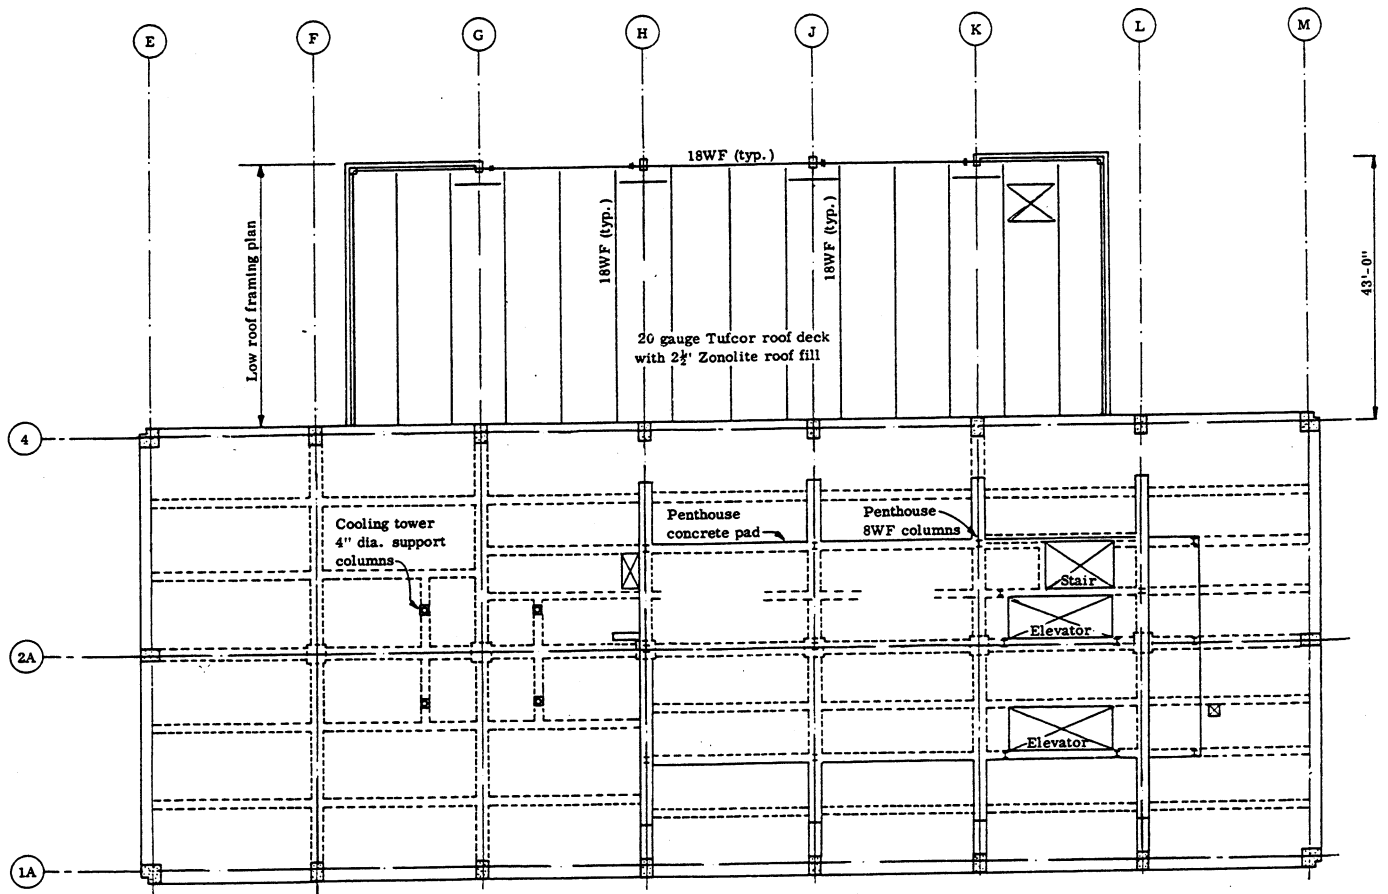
Roof framing plan at the 2<sup>nd</sup> and 14<sup>th</sup> floors (After Blume, 1973).
